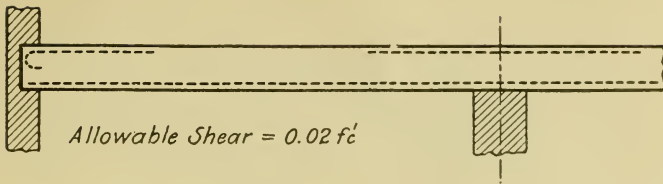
Typical Reinforced Concrete Beam; Principal Longitudinal Bars not Anchored.
